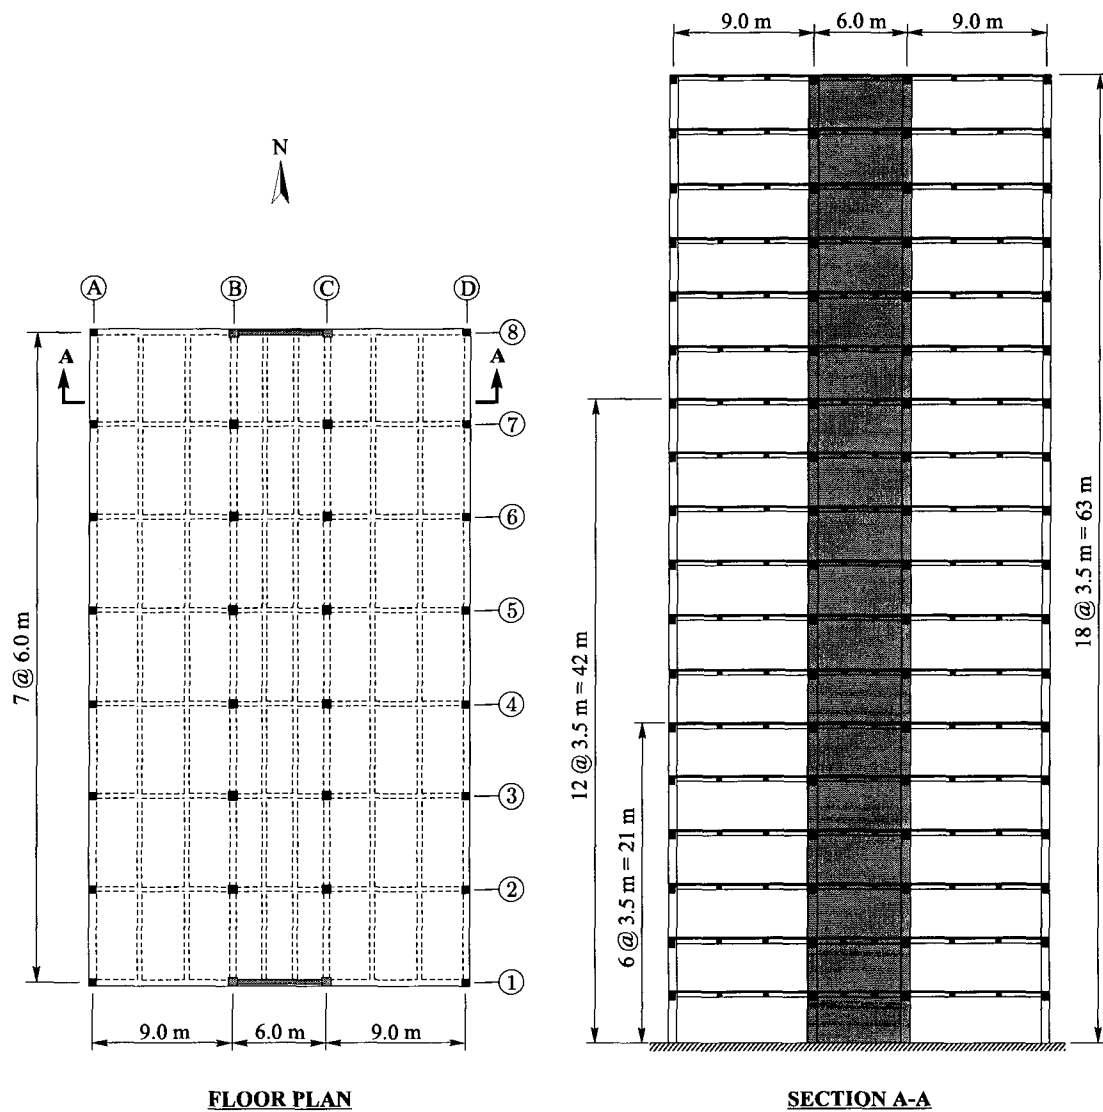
Buildings studied : (a) Typical floor plan ; (b) Elevations.
